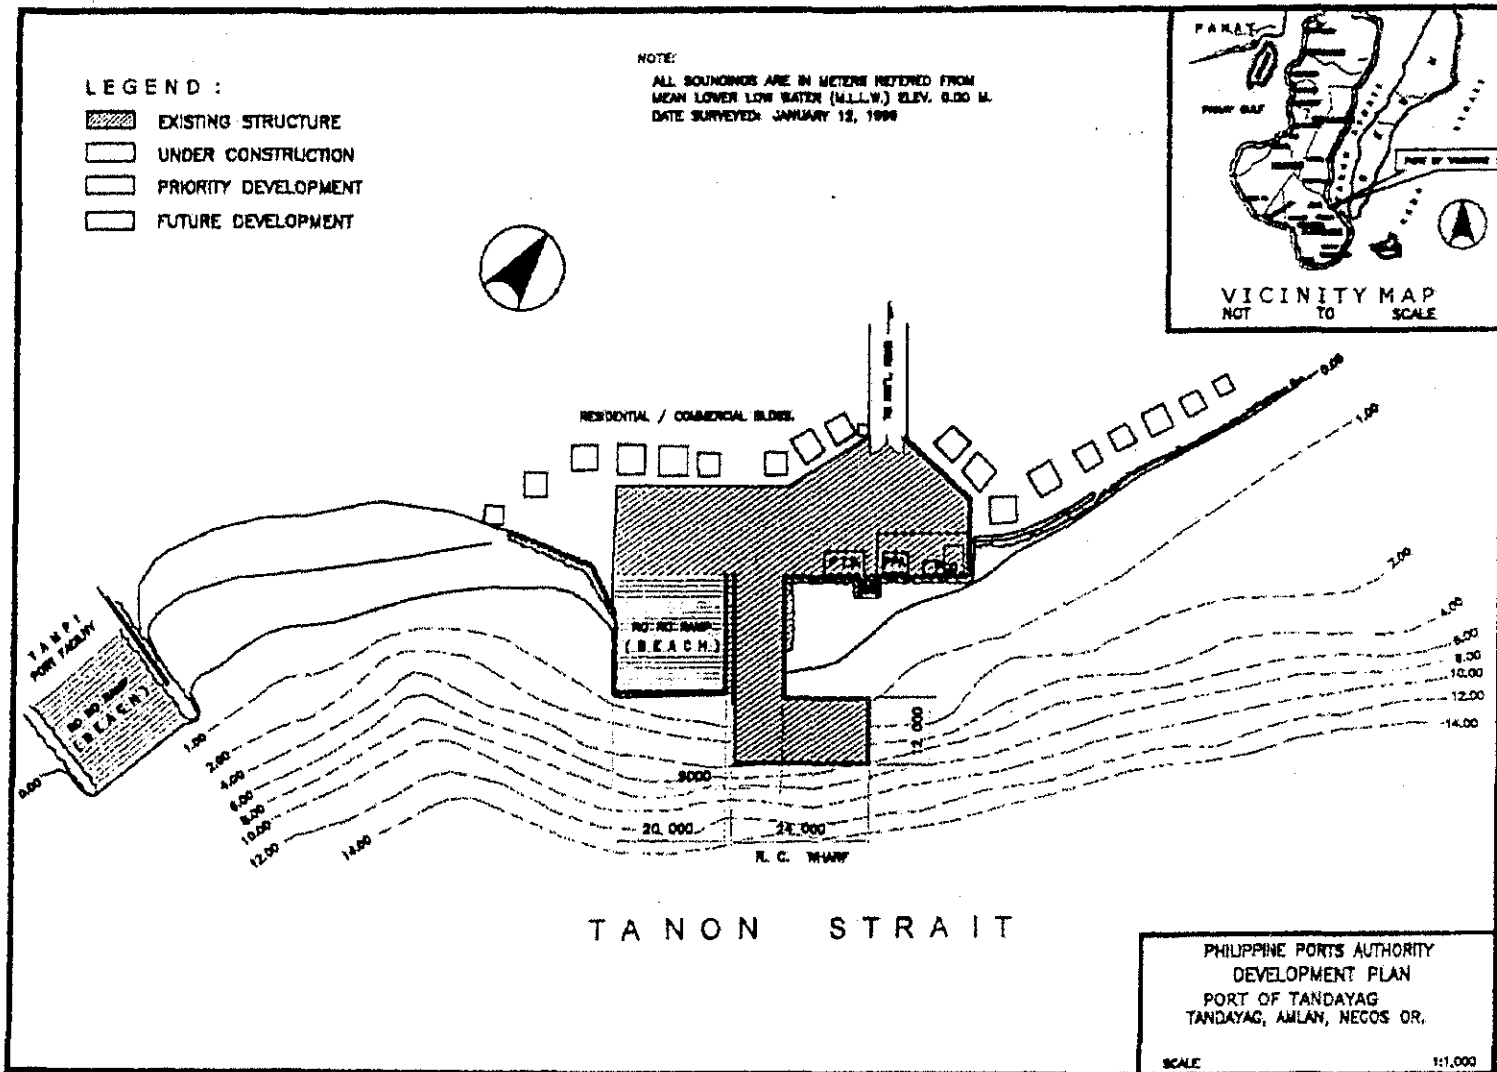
Development Plan - Port of Tandayag
